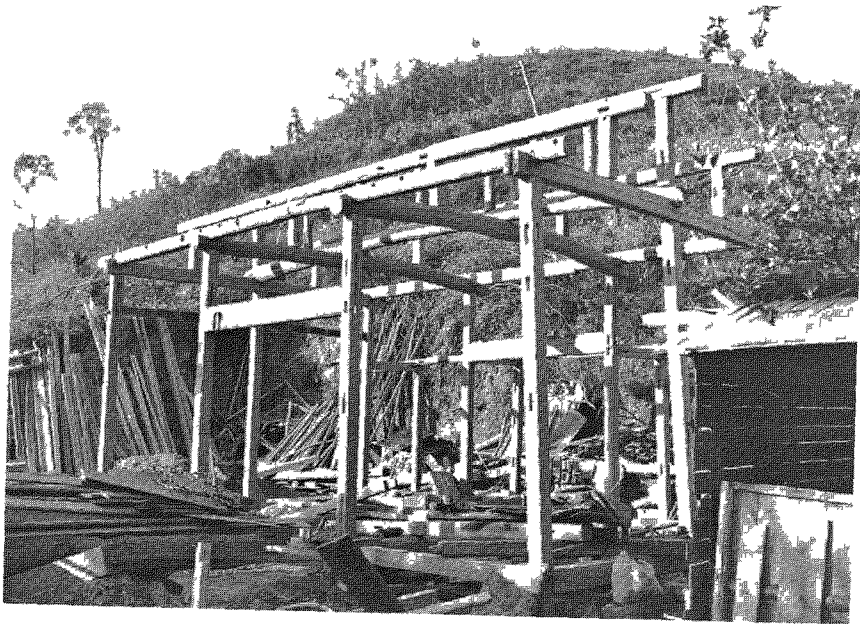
08 Upper photo Wood-frame building, 1 0 mile from ground zero at
